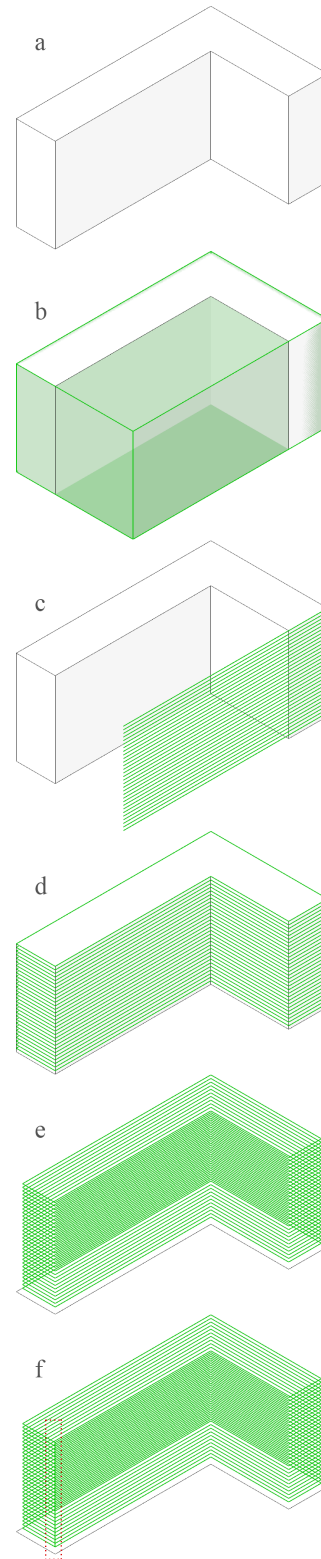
Step-by-step process of the slicer module creating tool paths from a surface geometry
